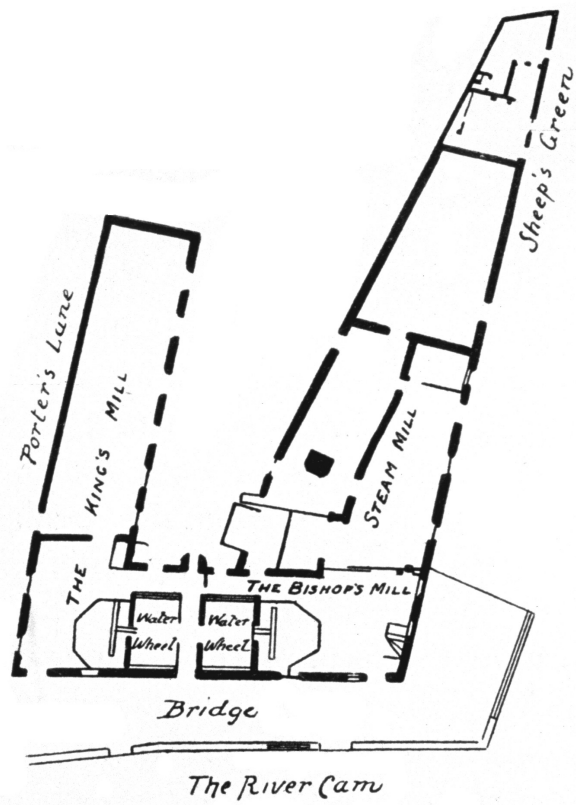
Plan of listed buildings (from Cambridge Historic Core Appraisal, 2006).
